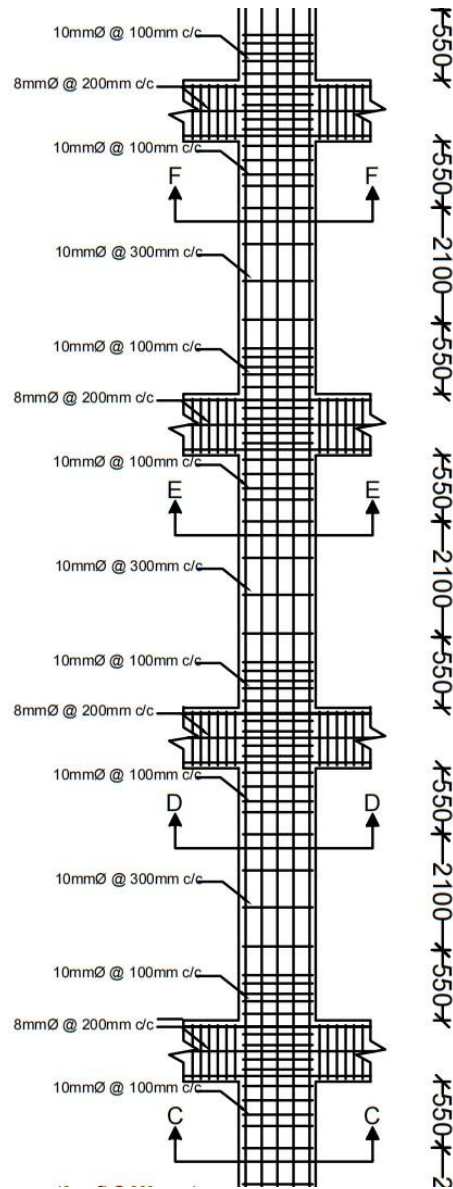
Reinforcement detailing of column section from Floor 1 to Floor 4
